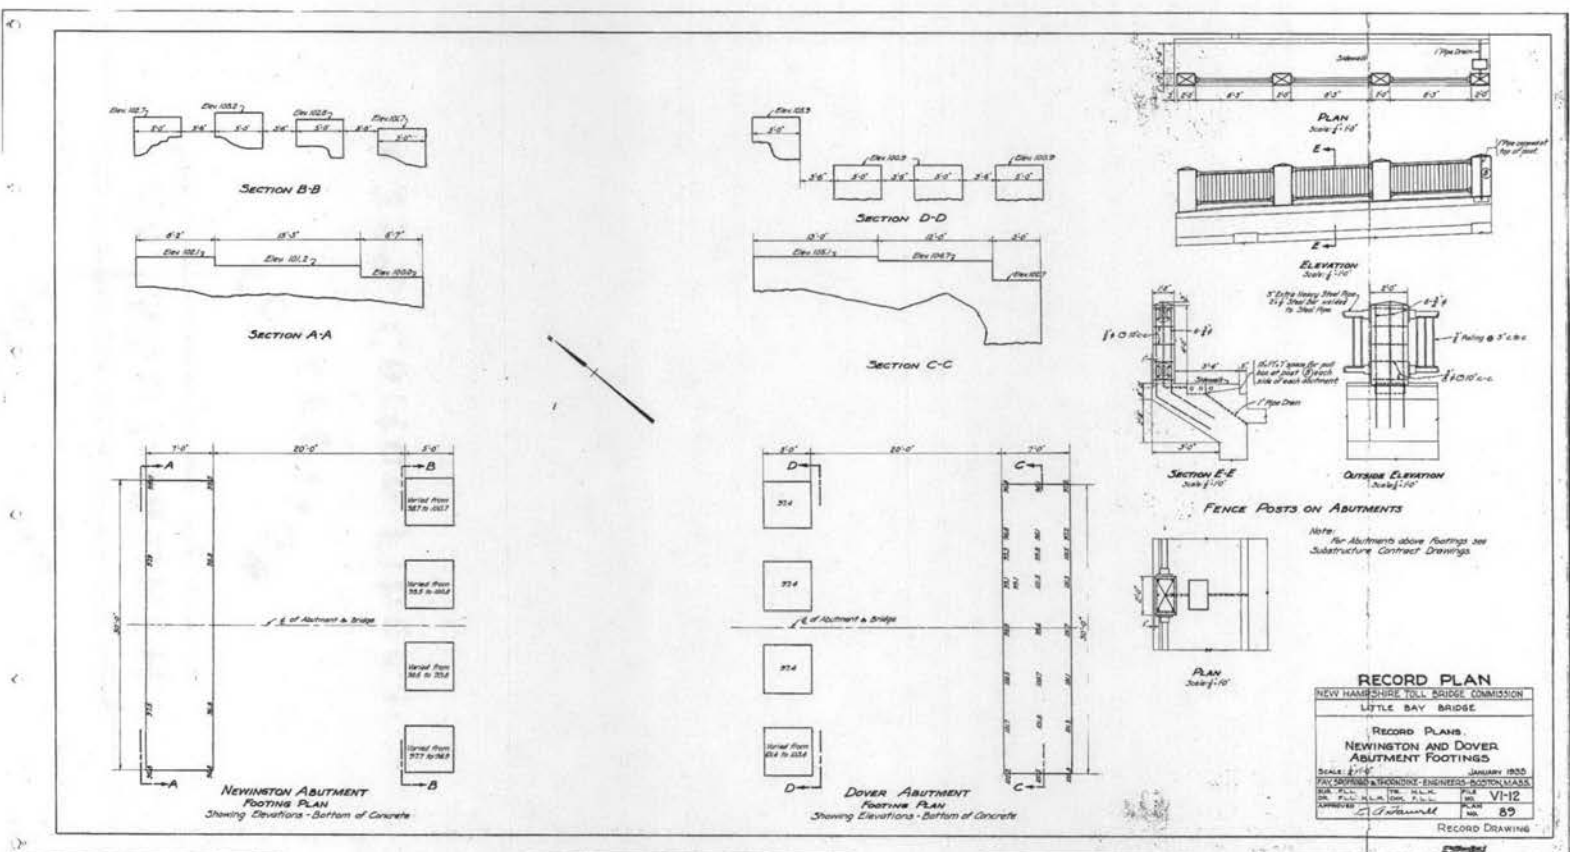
Record Plans, Substructure, Dover Abutment, VI-12-32
